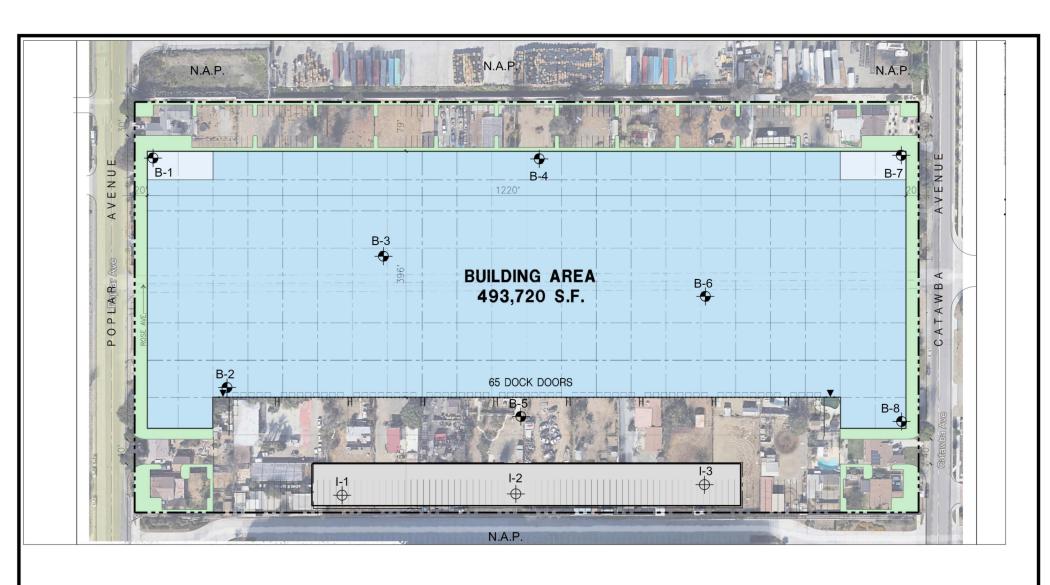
Infiltration Test Location Plan Boring Log Legend and Logs (5 pages)
